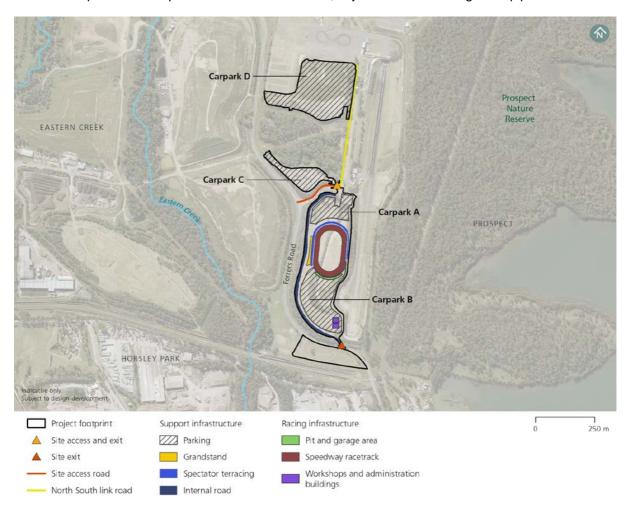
| Site Layout (Source: Sydney International Speedway EIS)
